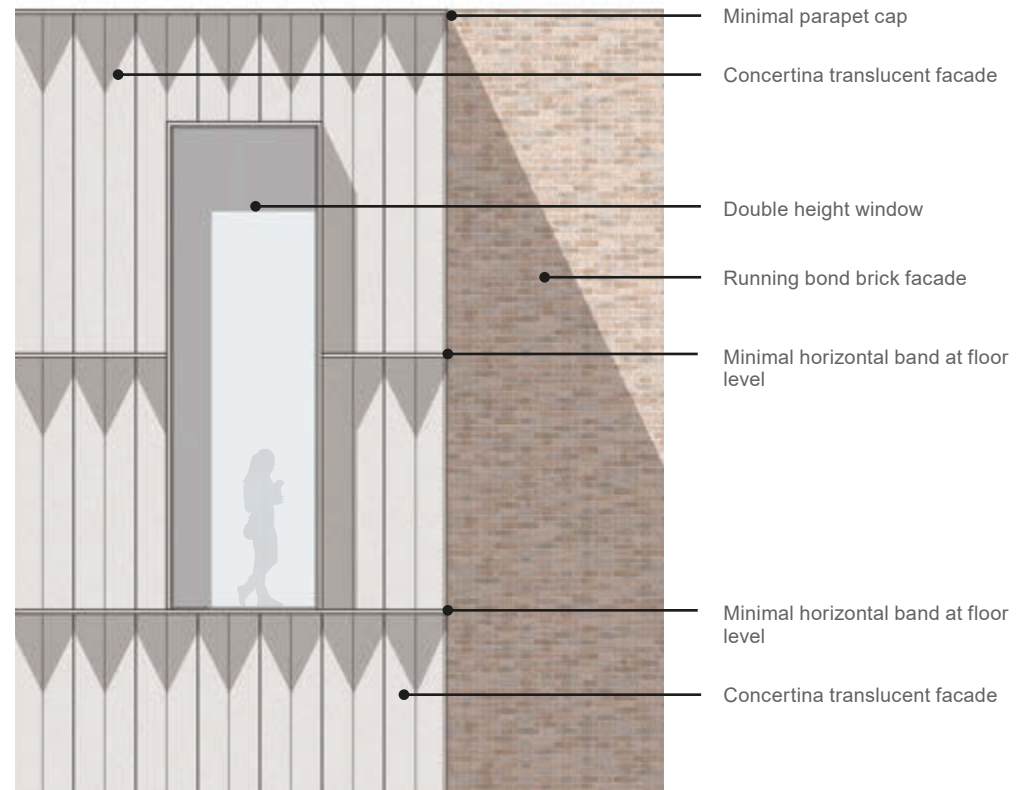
Illustrative fragment of Brick Lane East Facade (A)
